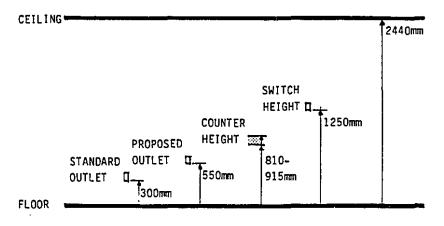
SWITCH AND OUTLET HEIGHTS source: Proposed by Author
